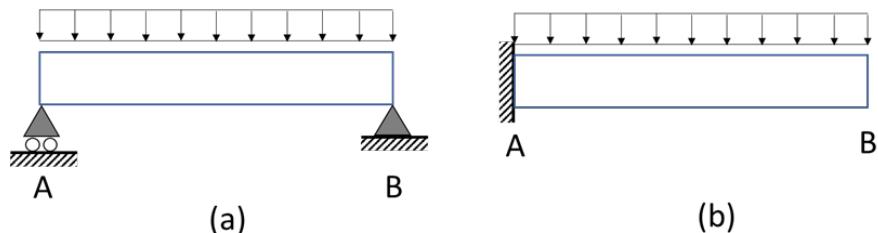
(a) Simply supported beam; (b) Cantilever beam
